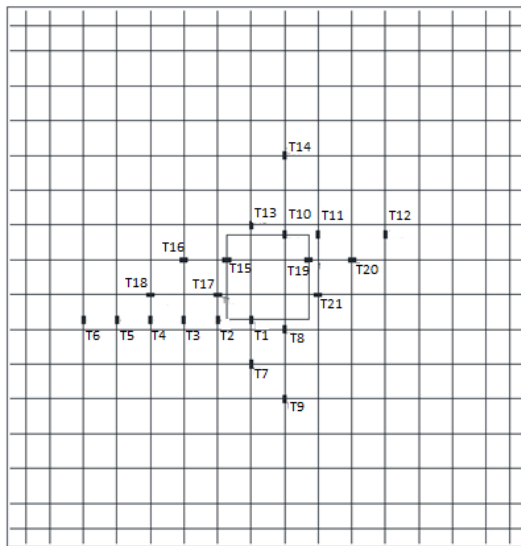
Tension reinforcement strain gage layout for 1.0% reinforcement ratio
